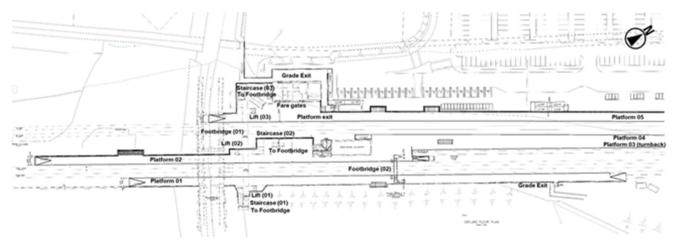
Hazelhatch & Celbridge Station. General plan.
